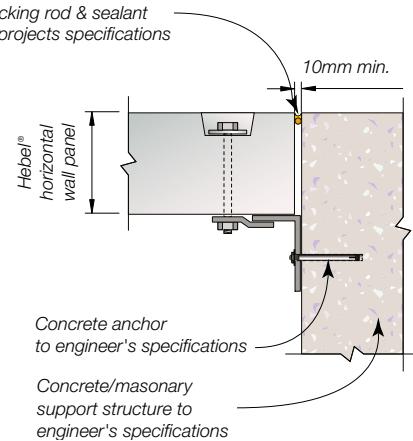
Horizontal wall panel & concrete/masonry support - Bottled Z Clip (plan).
